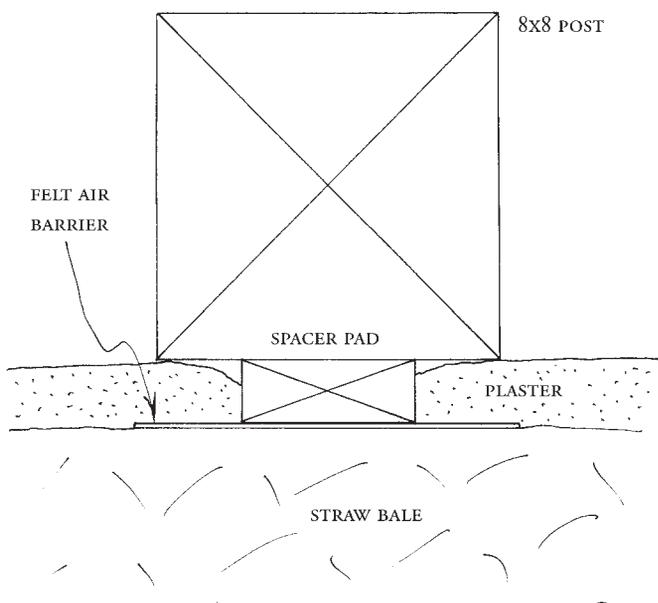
General scheme for interface between timber frame and plastered straw bale wall.
